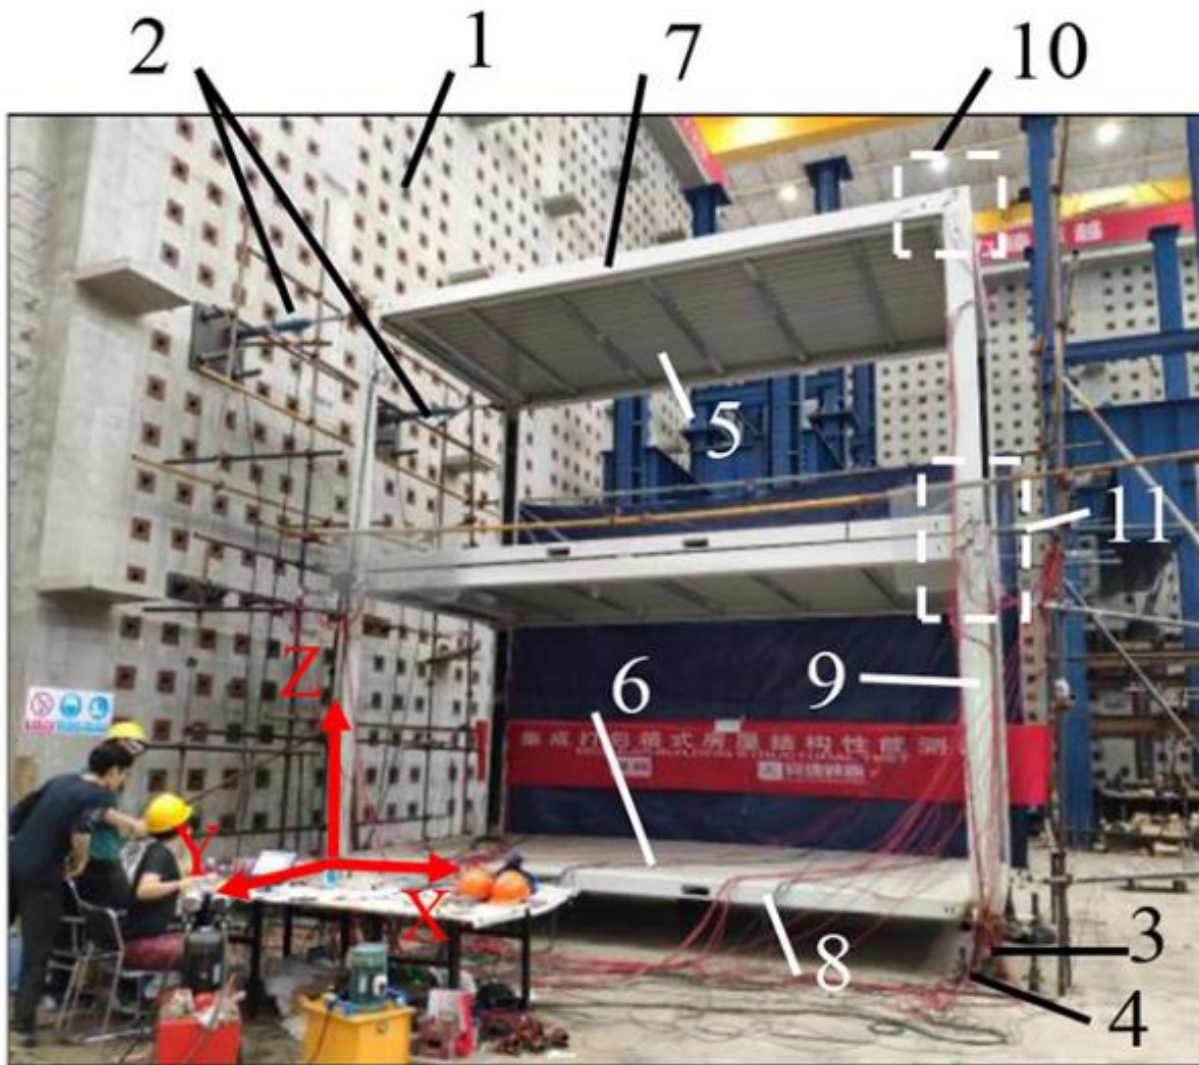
Full-scale test setup (Wang et al., 2021)
